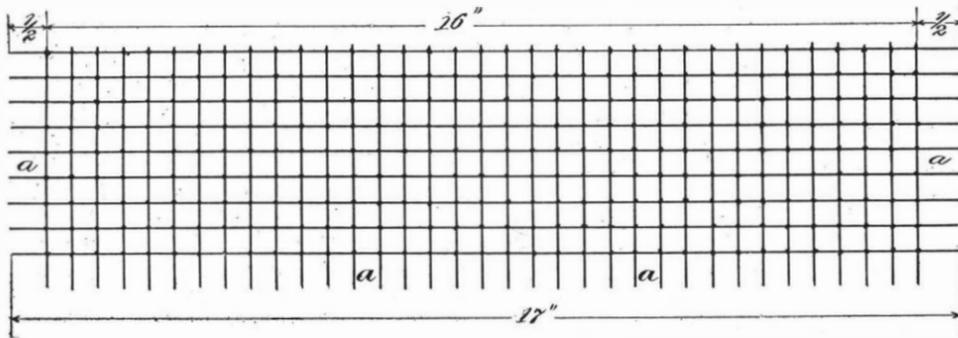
SIDE AND BOTTOM PIECE OF WIRE LATH FOR FRAME OF ROUND JAR.
